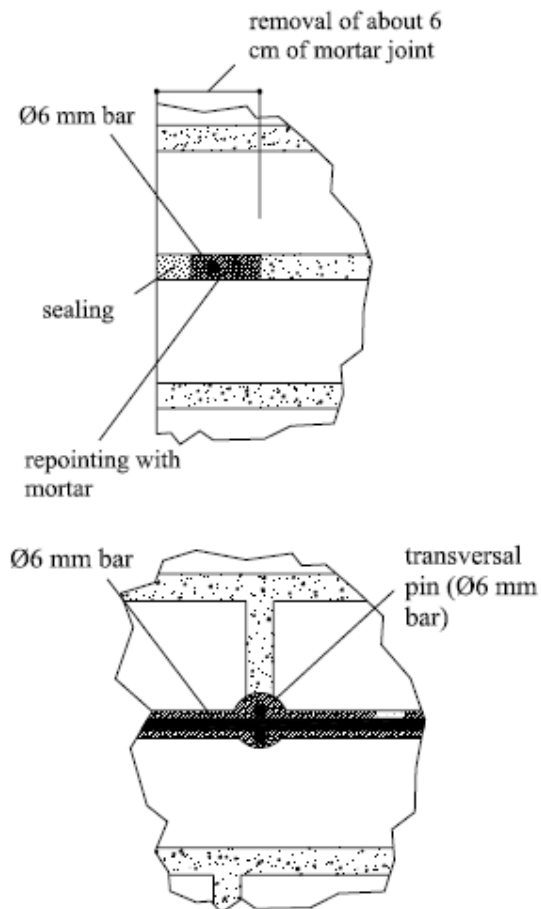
Details of the application of bed joint reinforcement
